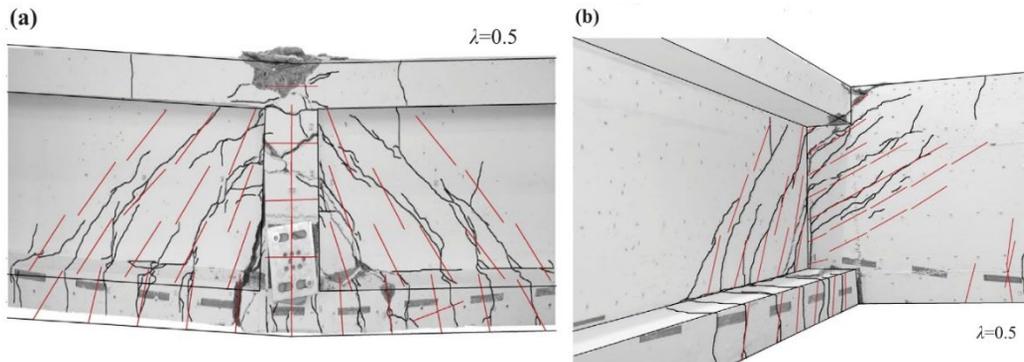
Crack pattern at failure: (a) view of longitudinal girder; (b) view of transverse girder–longitudinal girder. [11]
